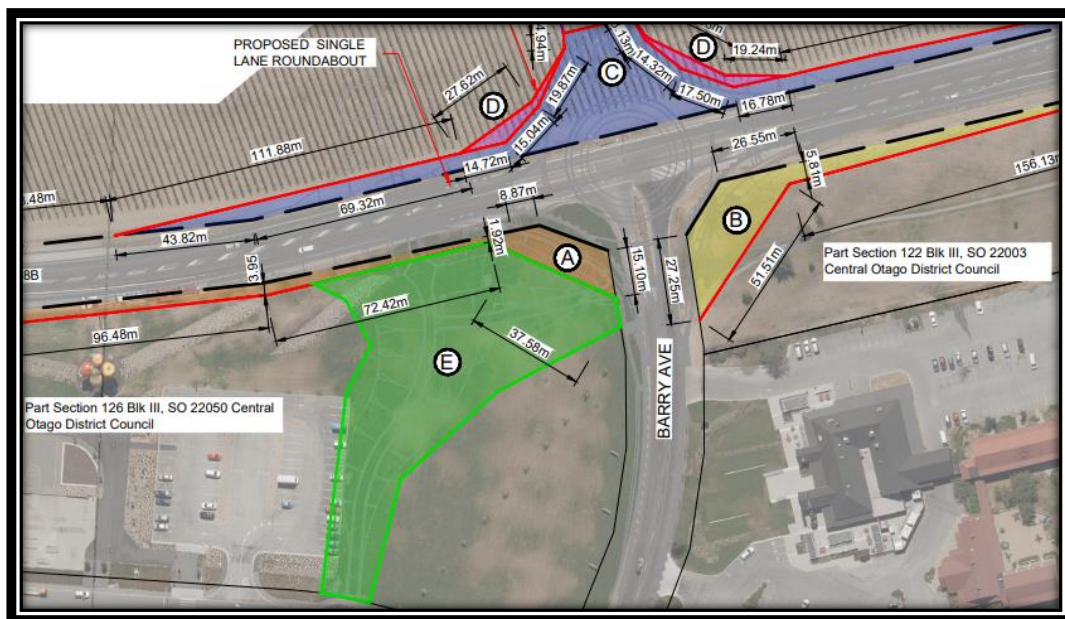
Previous Plan of Works/Land to be taken from RT OT13B/860
